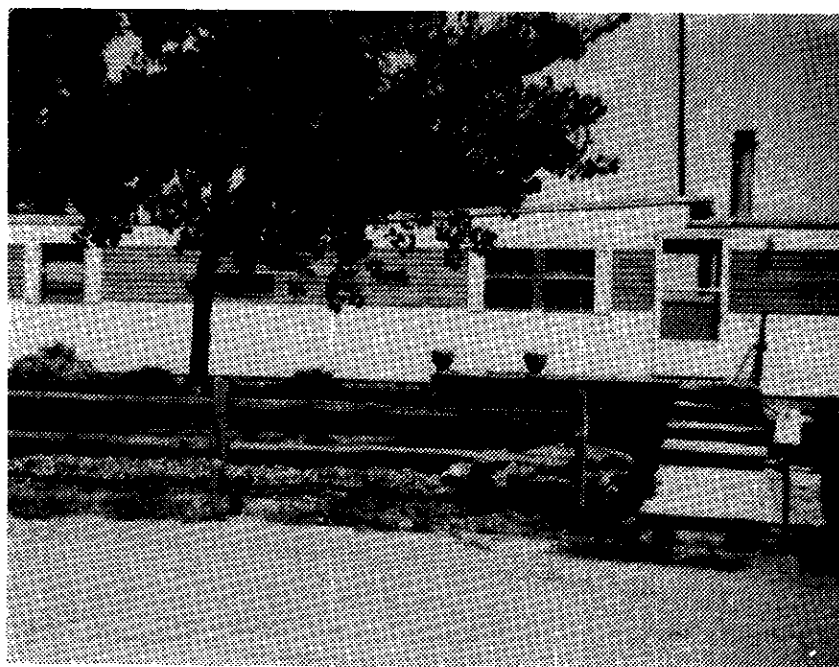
Floor is elevated on fill 3.5 feet above 100 year flood limit. La Junta, CO.
